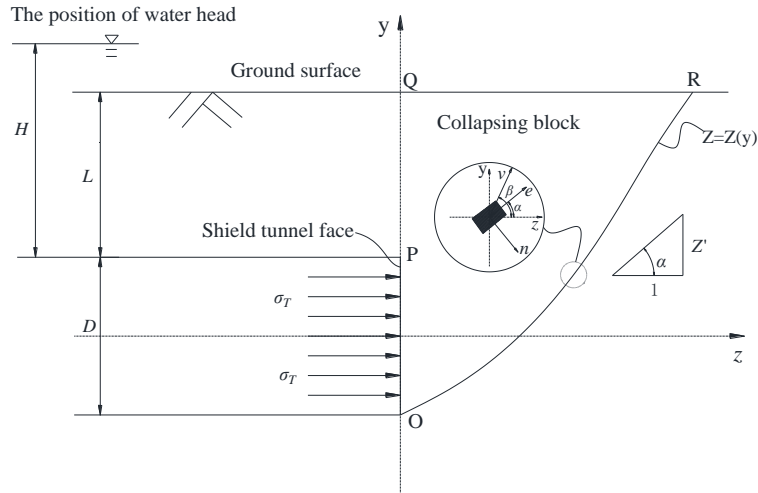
Mechanism of soil blow-out failure in front of excavation face underground water seepage
